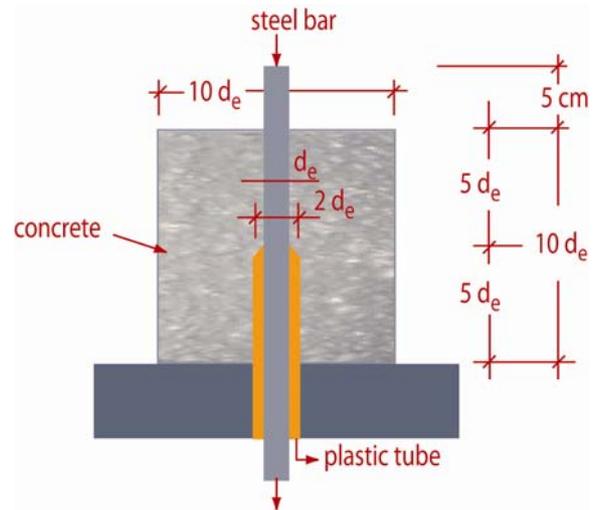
Reinforced specimen for the steel-concrete bond test according to RILEM-CEB.
